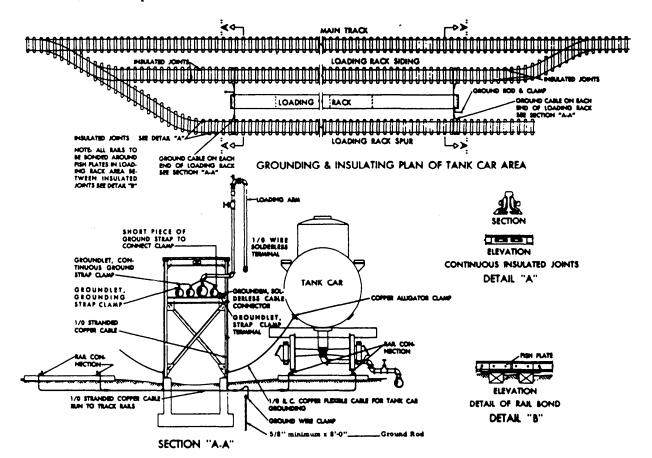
Typical Method of Grounding Tank Car Loading and Unloading Facilities.
